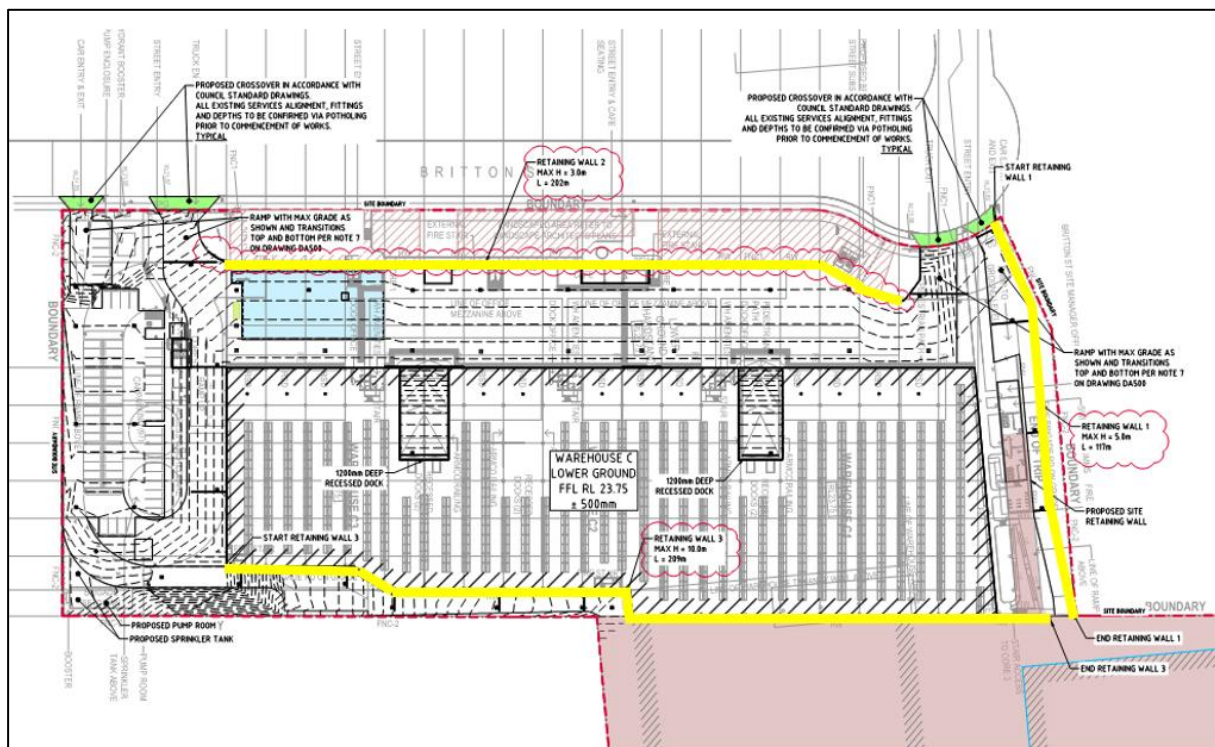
Location of Retaining Walls (Britton Street) (Source: Costin Roe, 2024)
